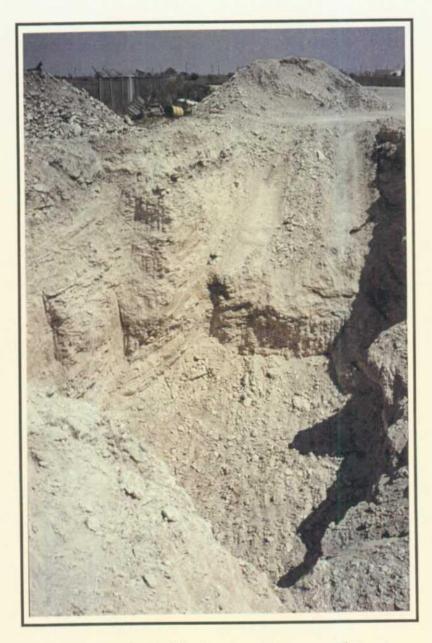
View South of Northeast wash bay excavation. Note Floor area excavated to 21 feet below ground level.
